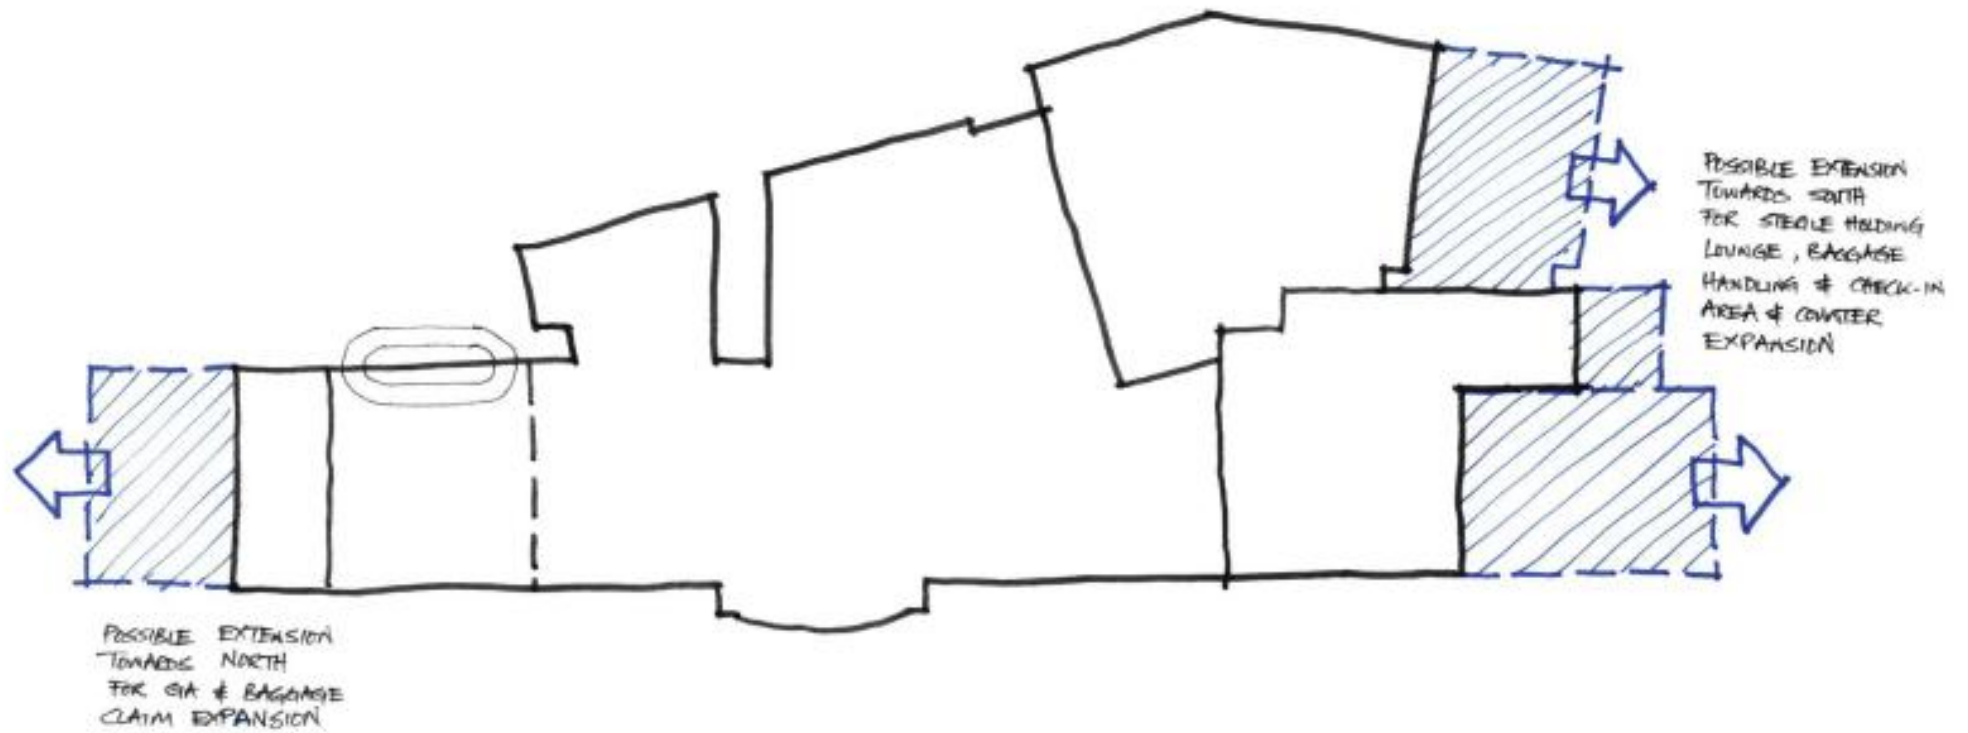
Terminal Building Expansion Plan – Additional Expansion Concept
